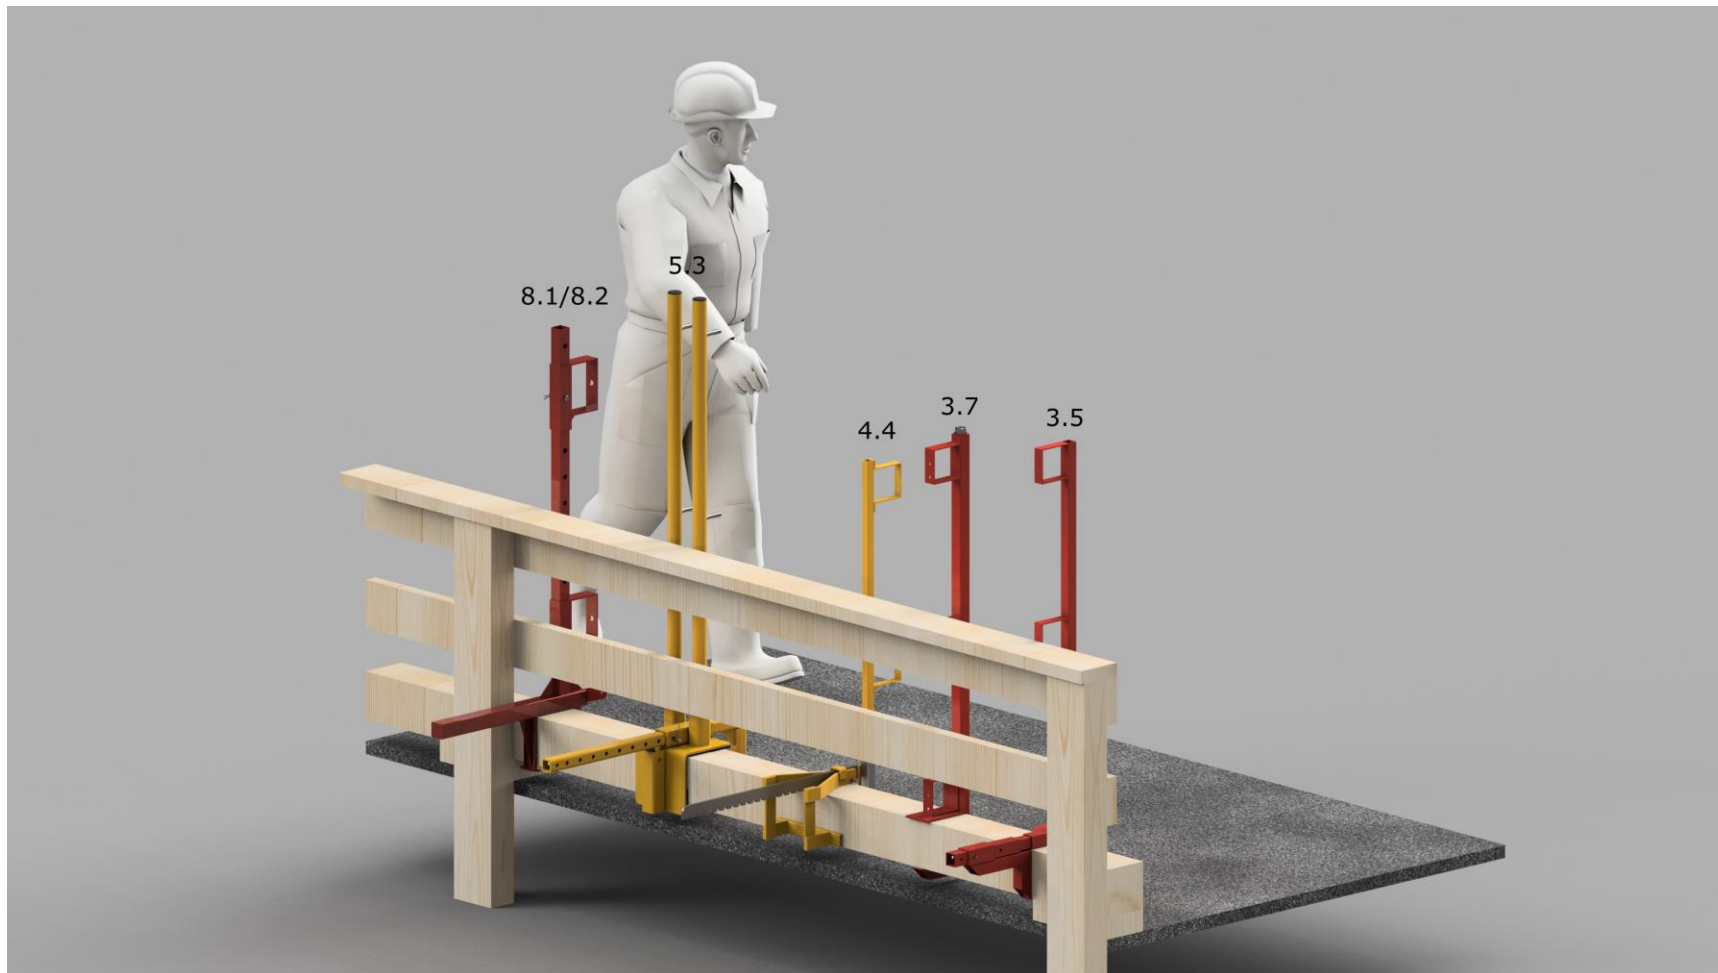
Guardrail Type 22, wheel guard fit; view from the southwest
